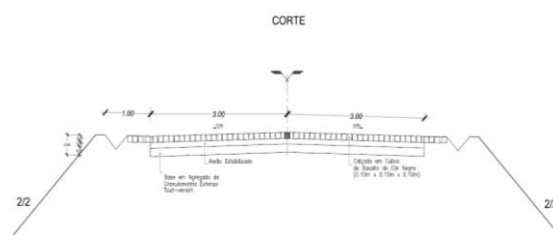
10: Profile cross-sectional – São Nicolau Island (Cape Verde Roads Institute, 2015)
